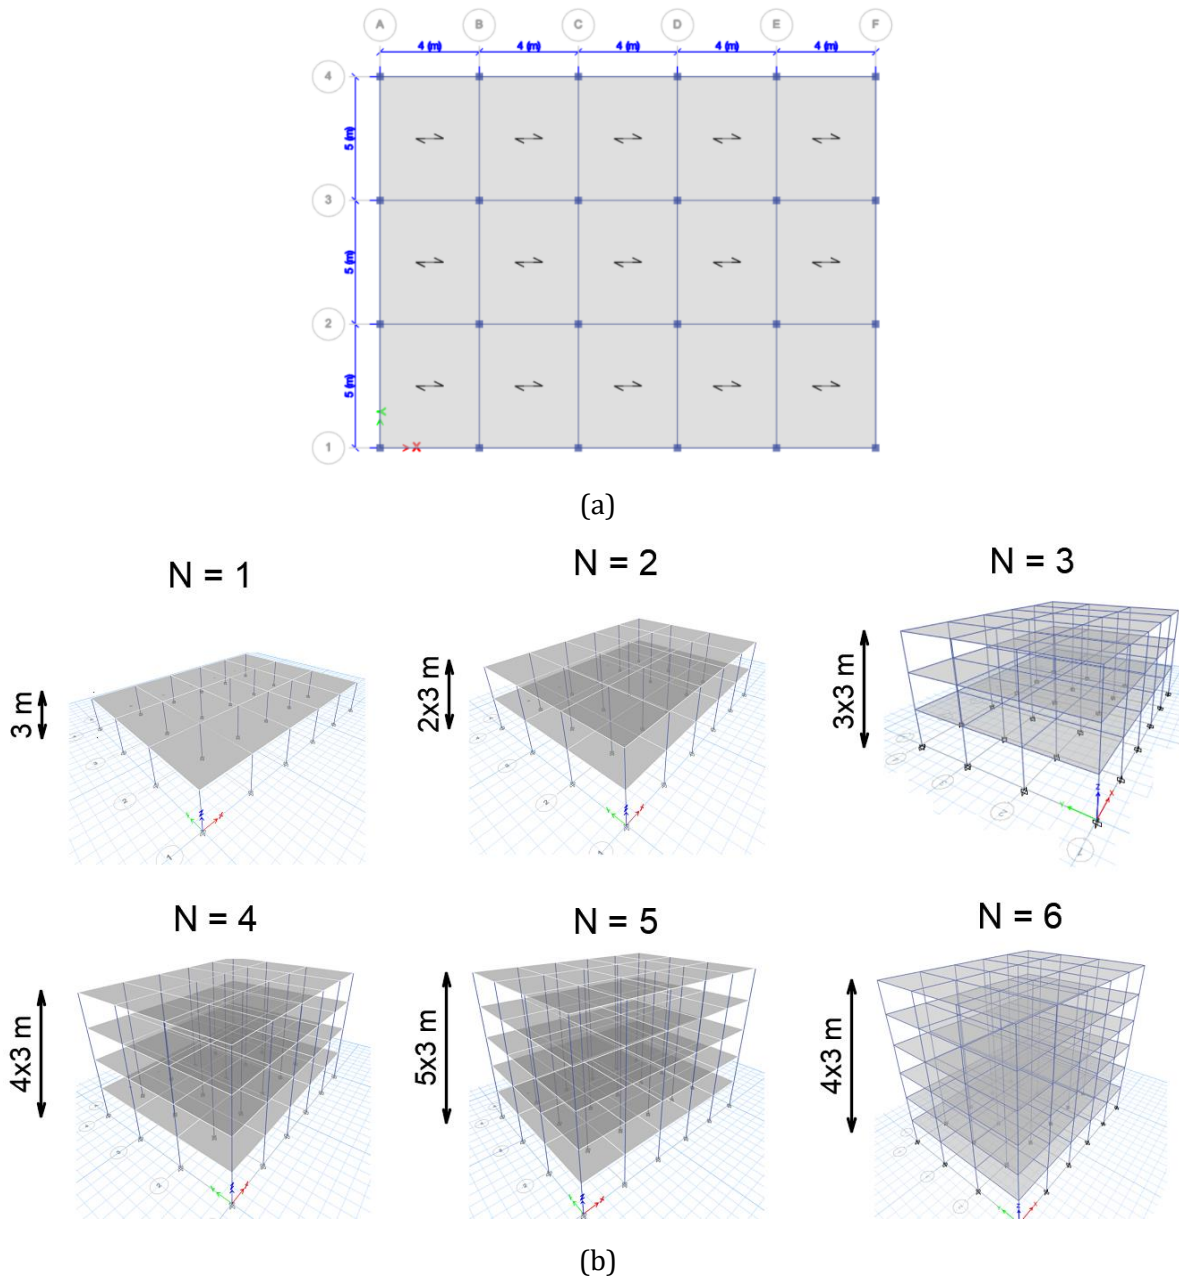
Archetype self-stable RC frame building: (A) plan layout; (B) elevation configurations
